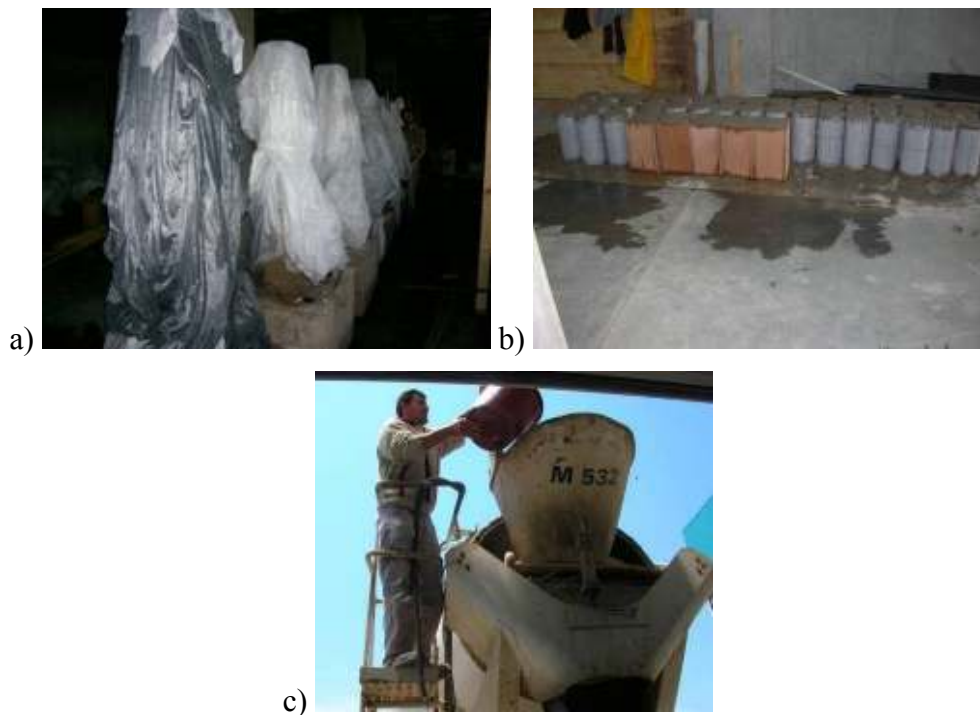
Preparation of columns: (a) Application of curing to the columns, (b) Preparation of standard cylinder specimens, (c) Addition of CaCl₂ to the concrete.
